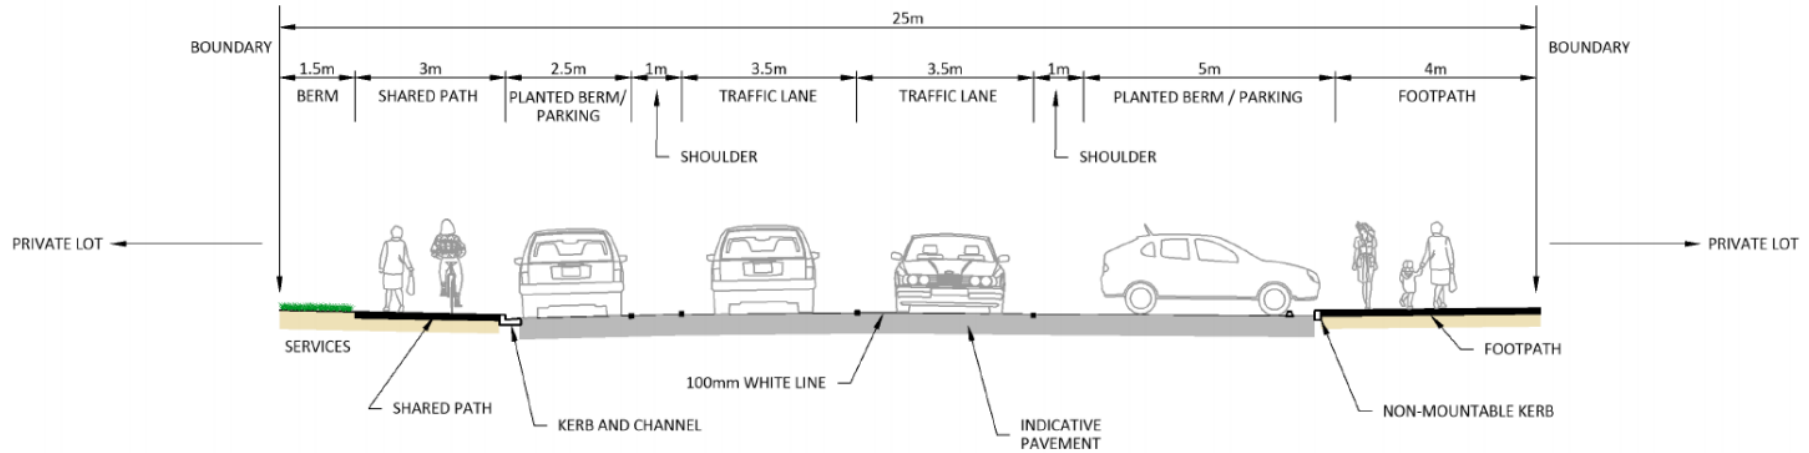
Ohinewai Structure Plan - Road cross sections – Local Roads (Residential Roads) Type 4
